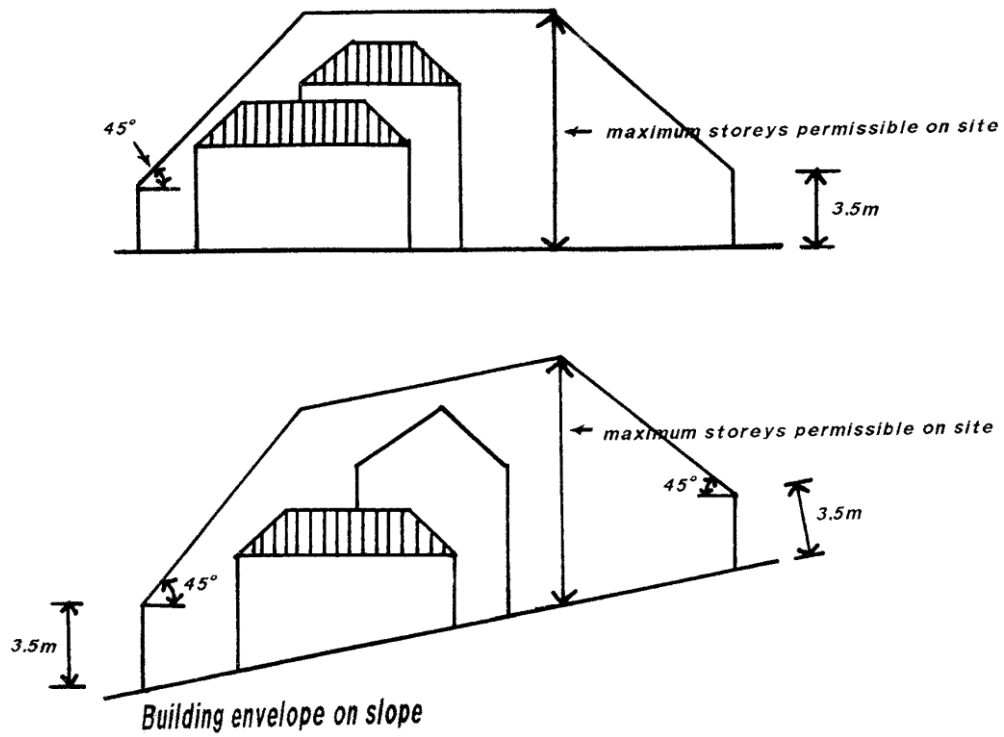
SIDE ELEVATION OF BUILDING ENVELOPE
